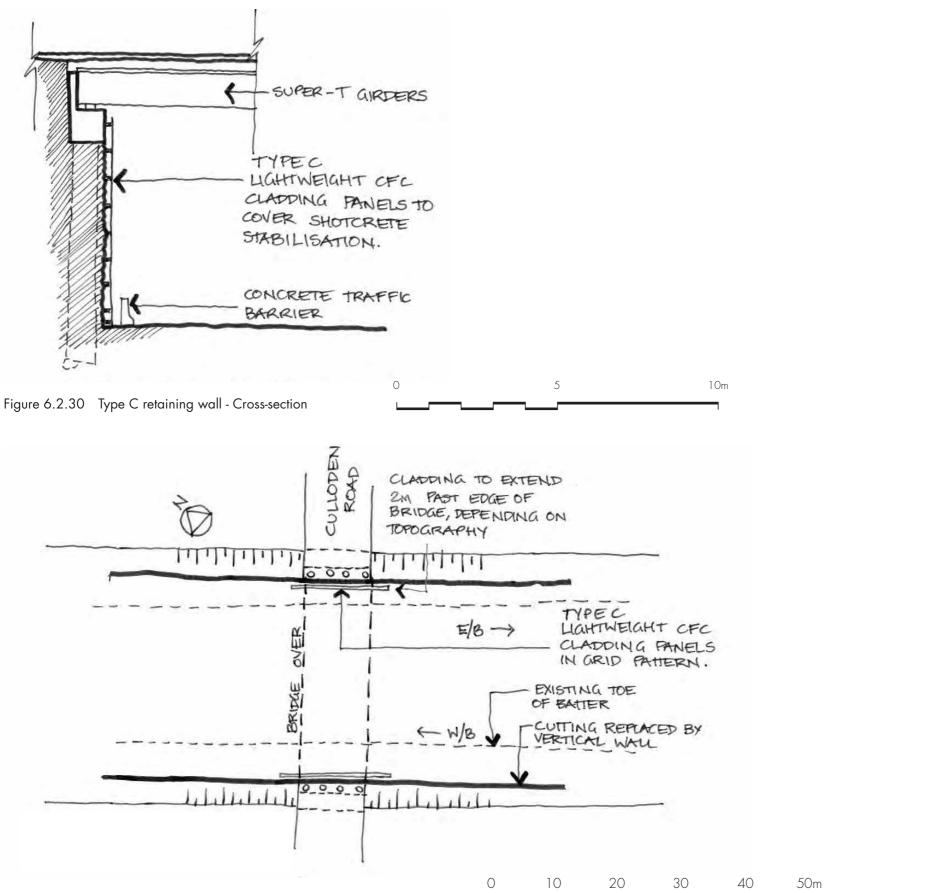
Type C retaining wall at Culloden Road Overbridge - Plan
